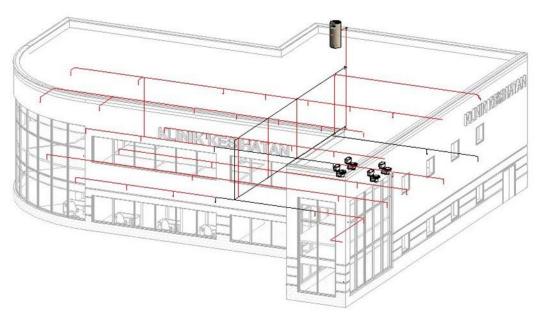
3D Layout of Fire Fighting Sprinkler System
